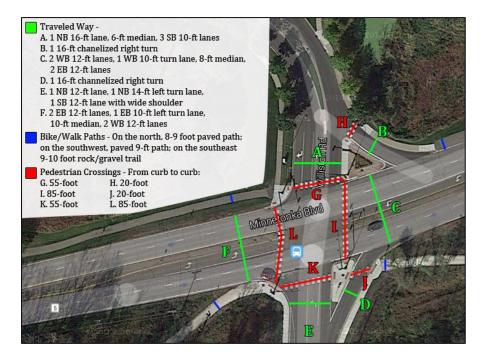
Intersection Detail and Measurements for Minnetonka Boulevard and Williston Road
